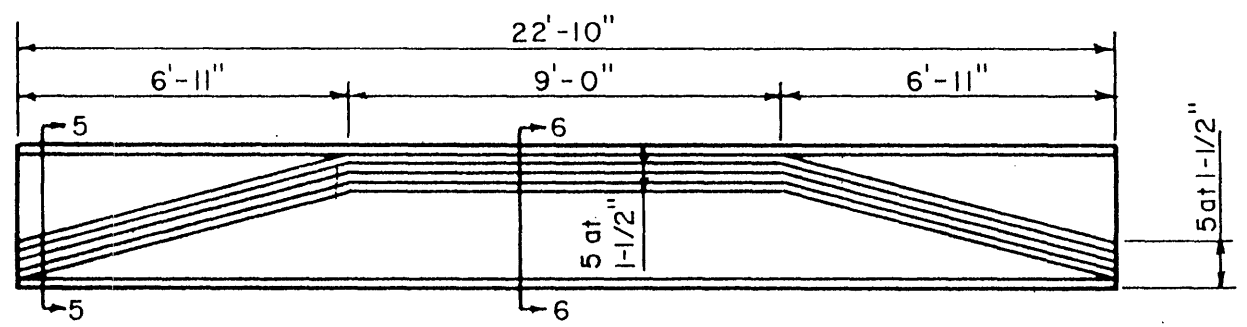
ARRANGEMENT OF LONGITUDINAL DEFORMED REINFORCEMENT IN MODEL 2
